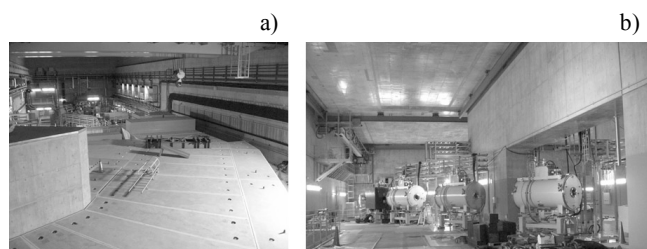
a) Photograph of radiation shields being installed, and b) photograph of RI-beam delivery line being assembled.
